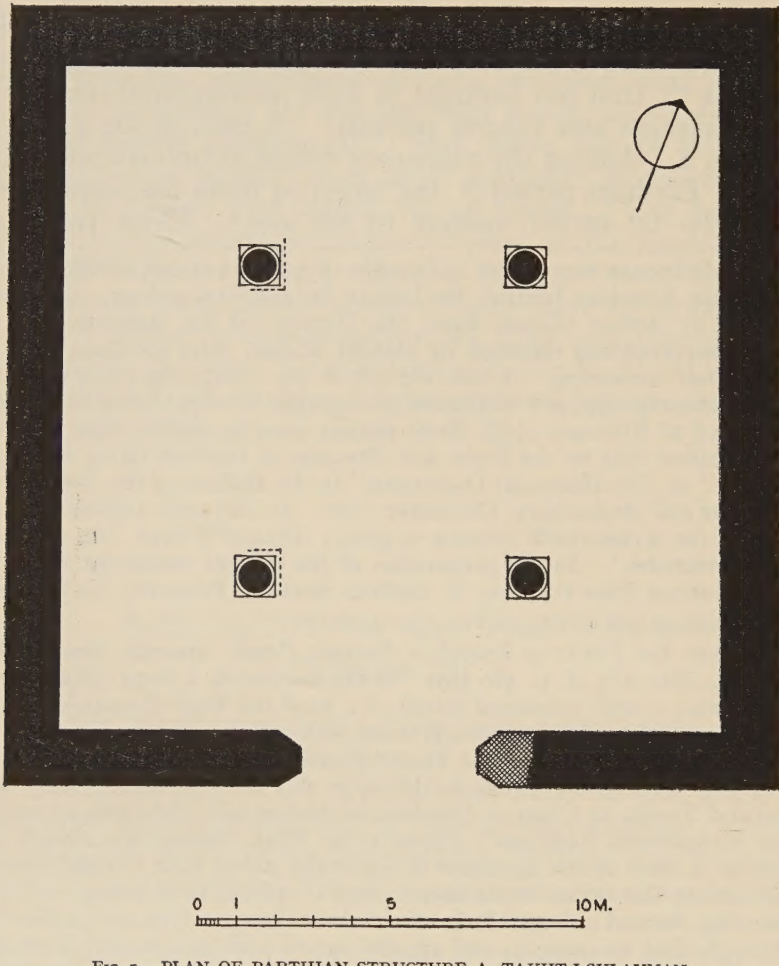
PLAN OF PARTHIAN STRUCTURE A, TAKHT-I-SULAYMAN
